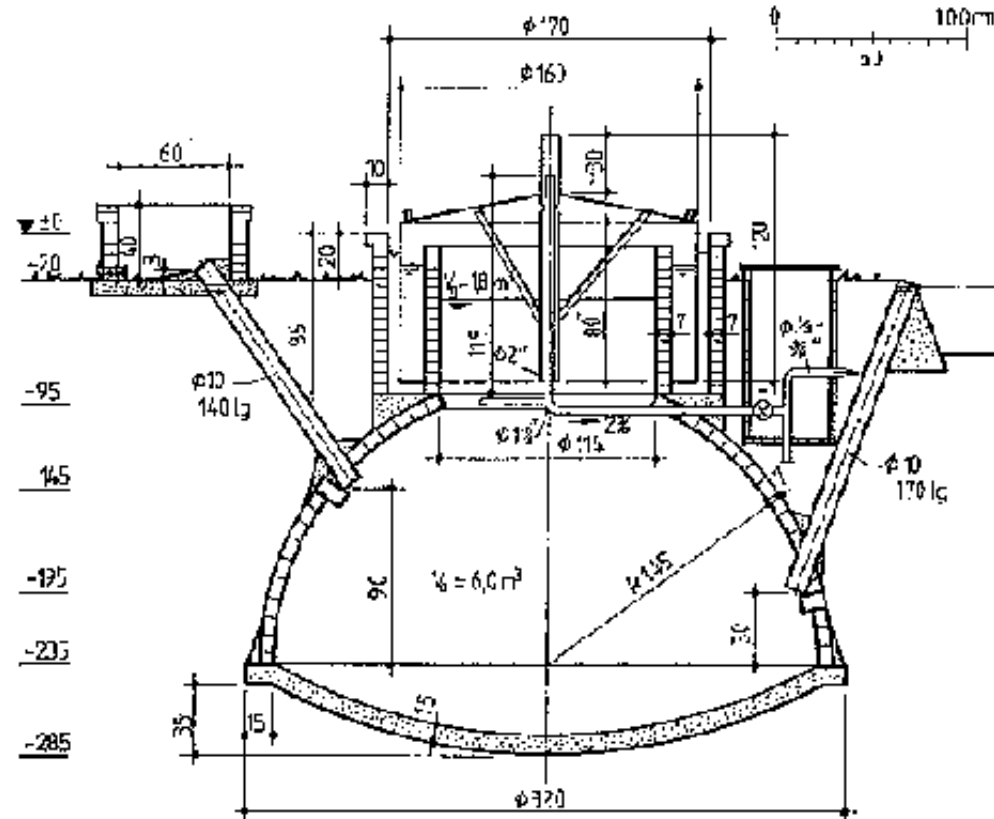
Constructional drawing of a water-jacket plant. $V_d = 6.0 \text{ m}^3$, $V_g = 1.8 \text{ m}^3$. Material requirements: Excavation 16.0 m^3 , Foundation 1.6 m^3 , Masonry 1.6 m^3 , Rendered area 21 m^2 , Sheet steel 5.7 m^2 . (Source: OEKOTOP, Sasse)
